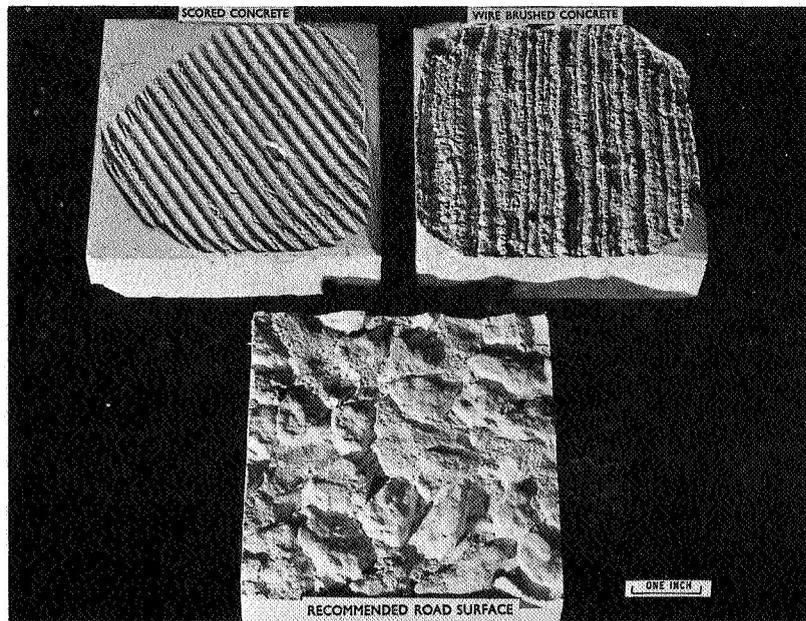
Plaster casts of two concrete runway surfaces and a recommended road surface.
